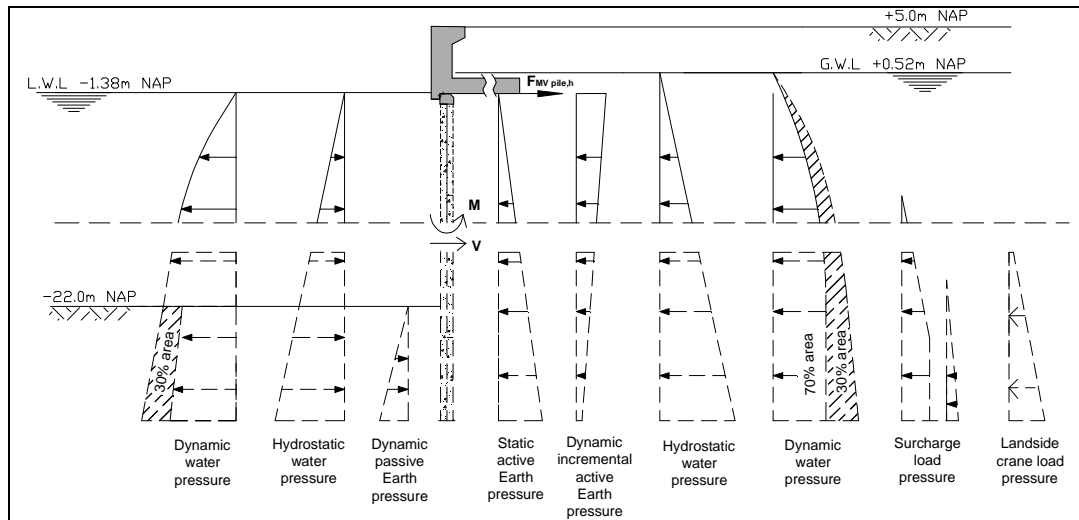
Horizontal pressure components and anchor force acting on the diaphragm wall
